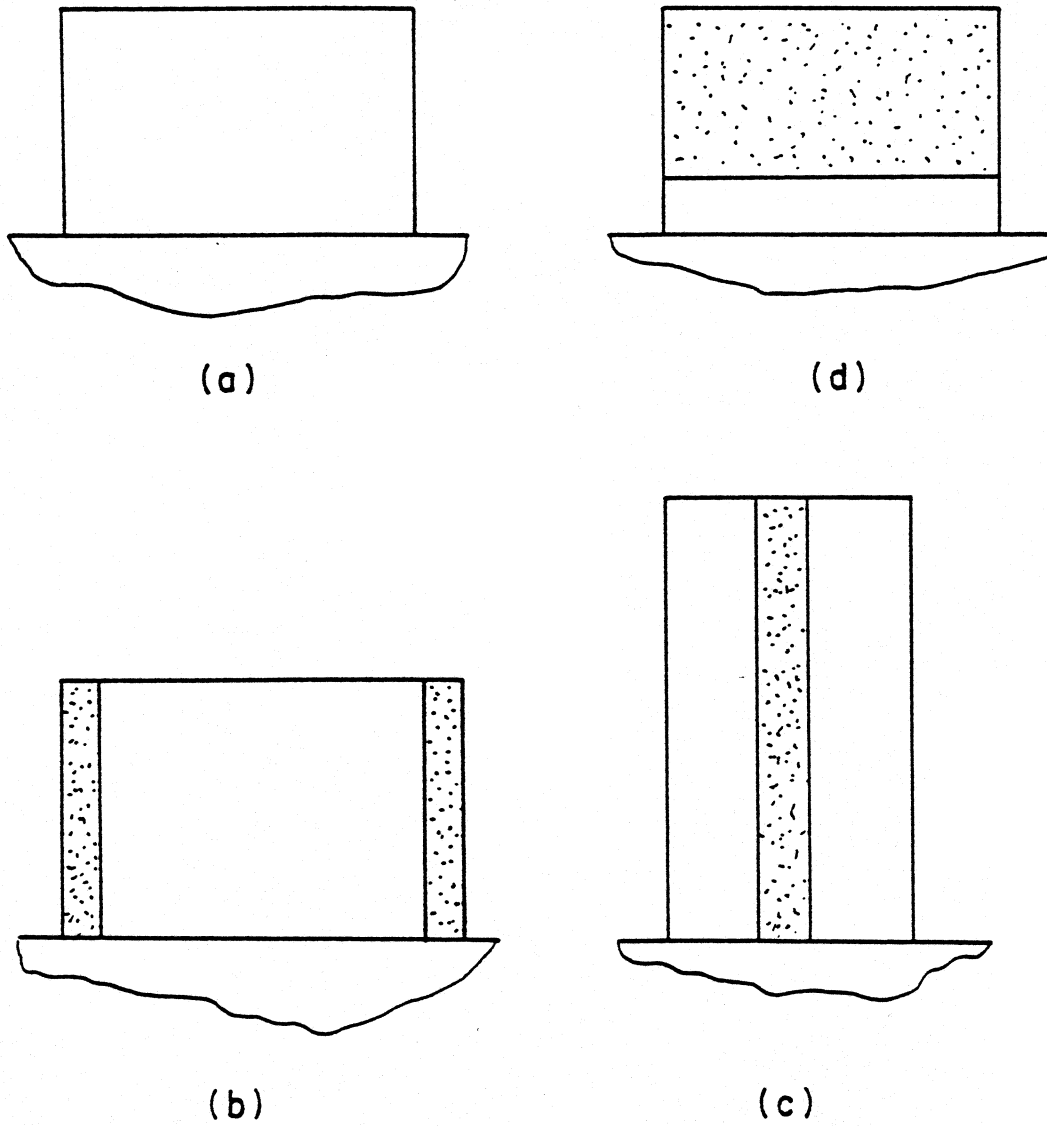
a) A building without major discontinuities. b) A building with two shear walls at the ends. c) A building with a central core. d) A building with "soft" first floor.
